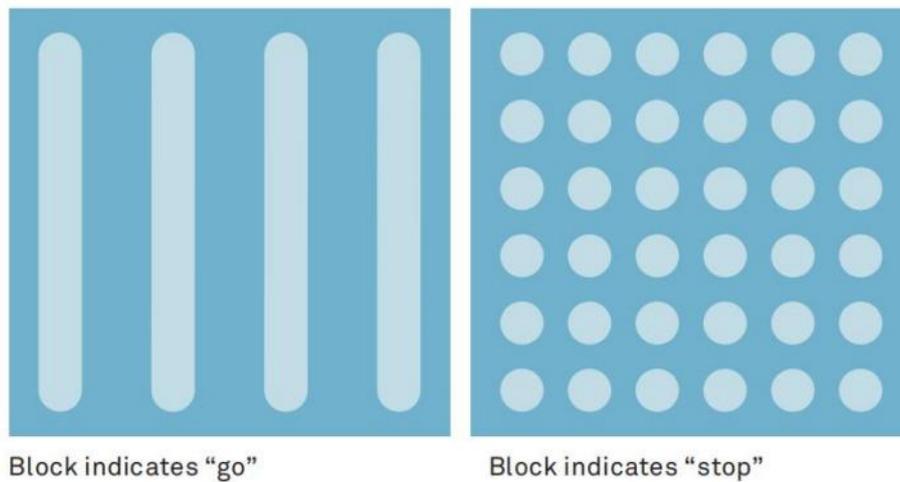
Block indicates “go” and block indicates “stop” (Source: Global Street Design Guide)
